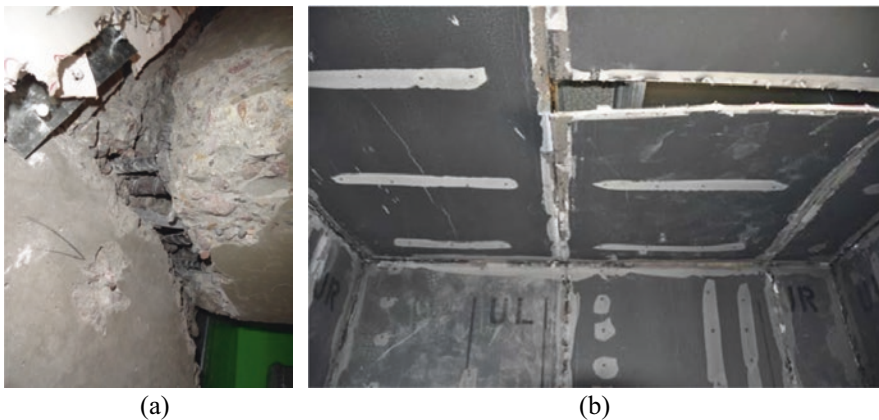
(a) Damage to reinforced concrete beam-column connection [44]; (b) Damage to gypsum board ceiling system post ground motion and fire [49]
